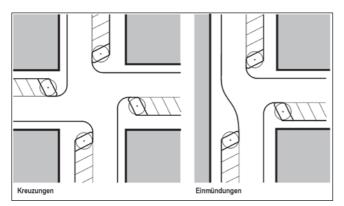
Layout of chicanes at crossings and junctions (outline sketch)
